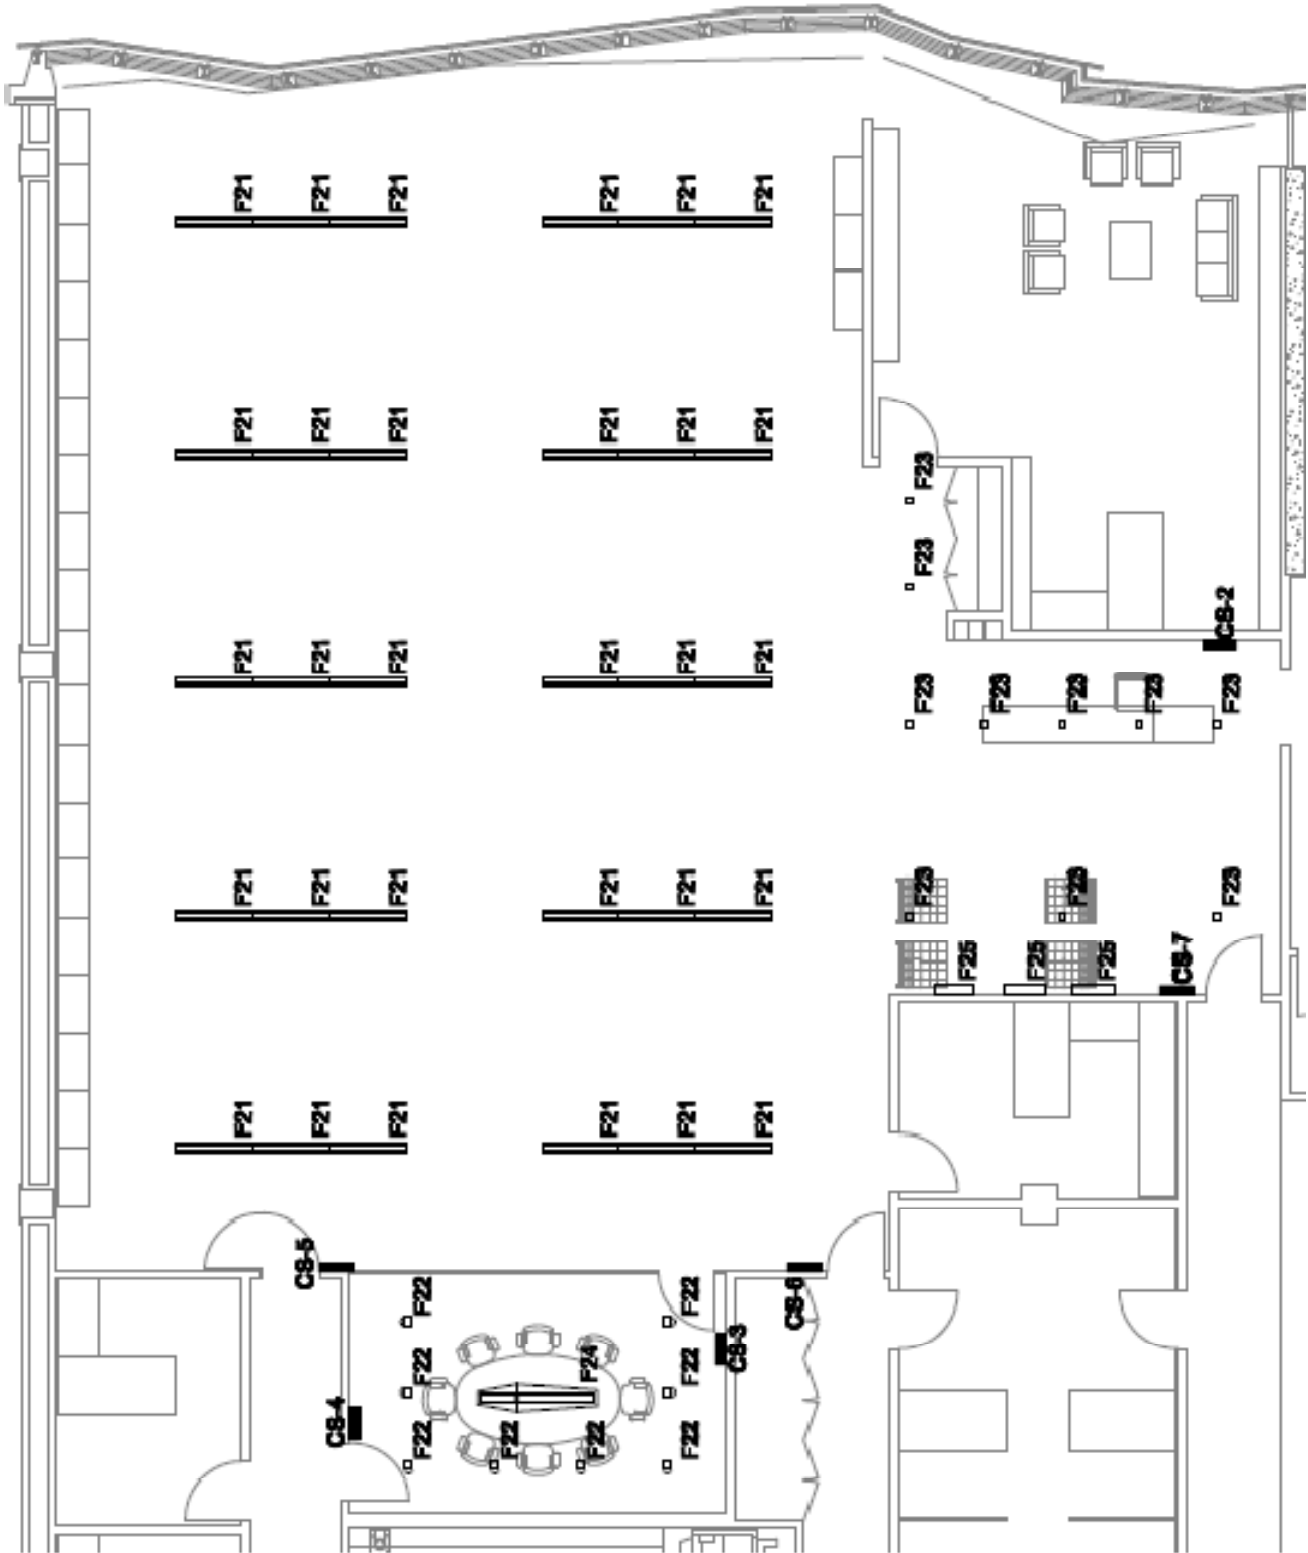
OPEN OFFICE LIGHTING PLAN
